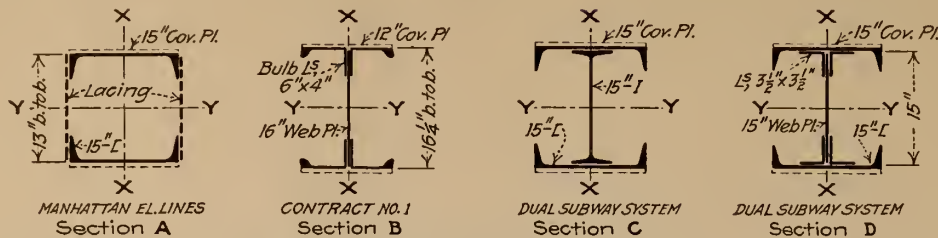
COLUMN SECTIONS OF ELEVATED RAILWAYS
